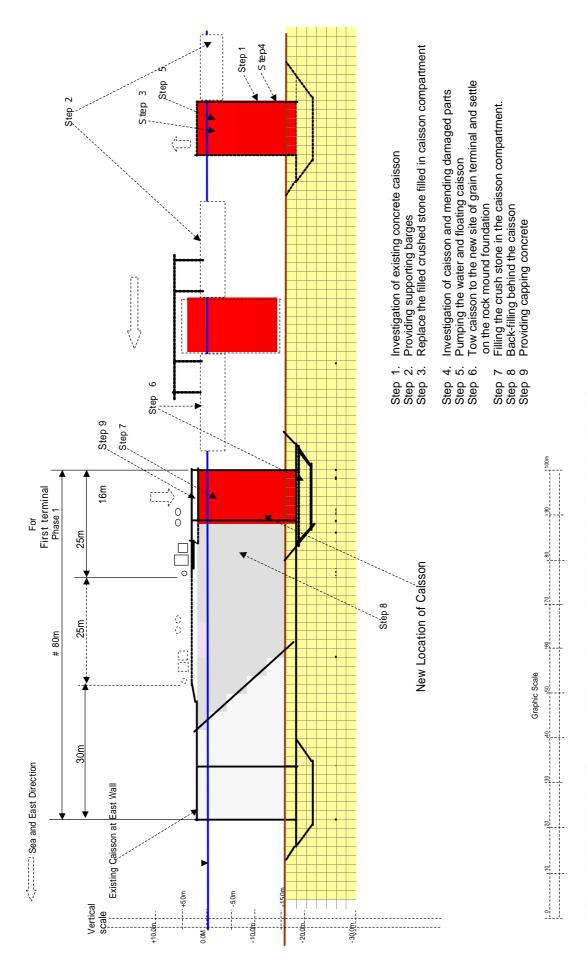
Existing Concrete Caisson Removing Method for Grain Loading Pier
